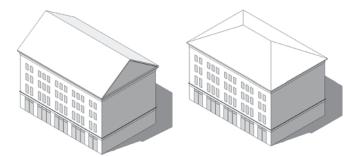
G.2.a.i: Gabled roof (left); Hipped roof (right)
